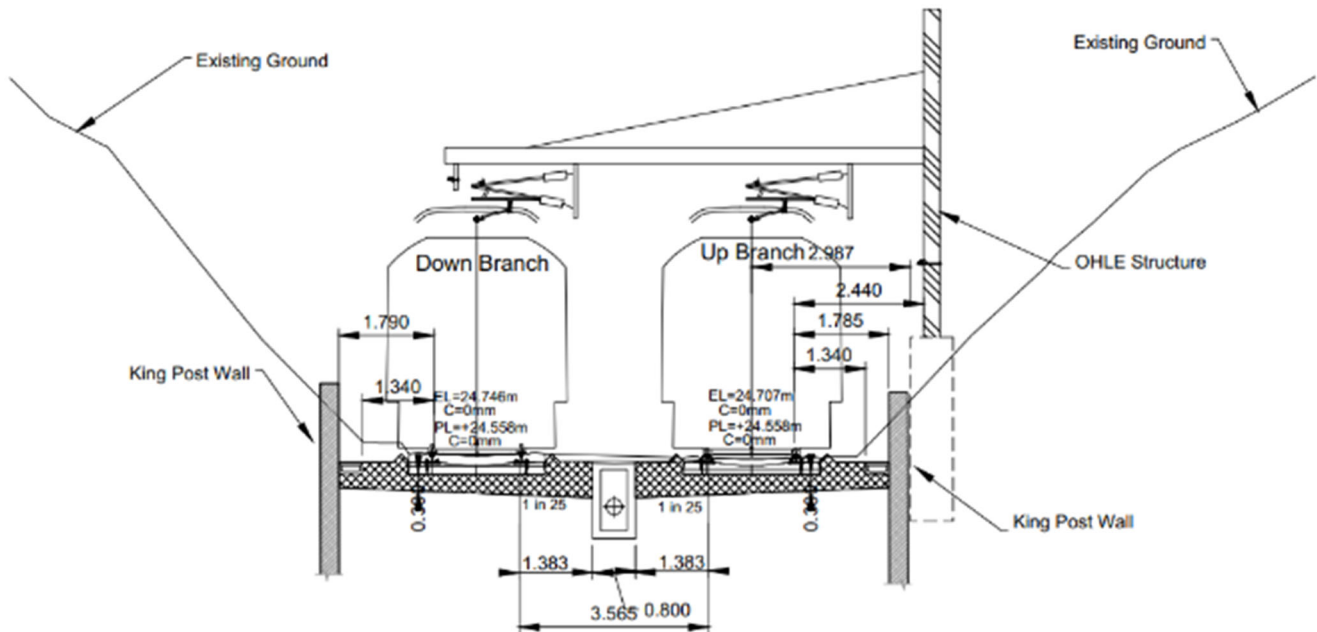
Typical Cross Section West of Glasnevin Cemetery Road Bridge (OBO10), View from Glasnevin Junction
